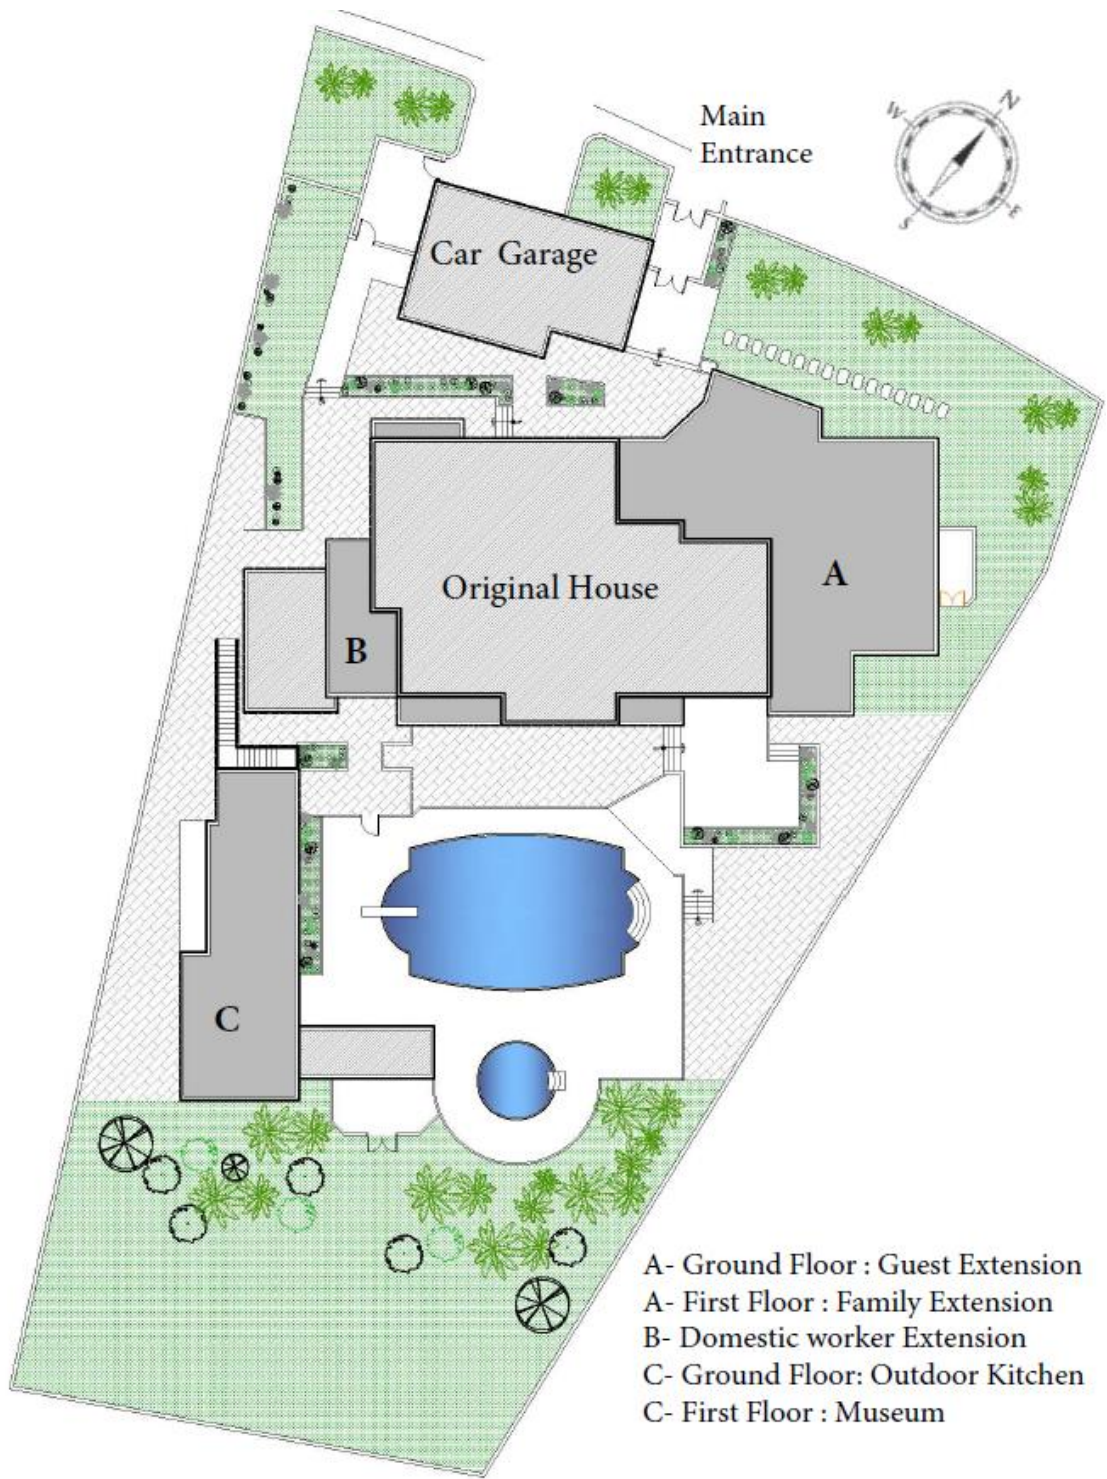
The extension of the house, with the three additional buildings A, B, and C. Building A and B are attached to the house, whilst building C is a detached two story building located in the garden in front of the swimming pool.
